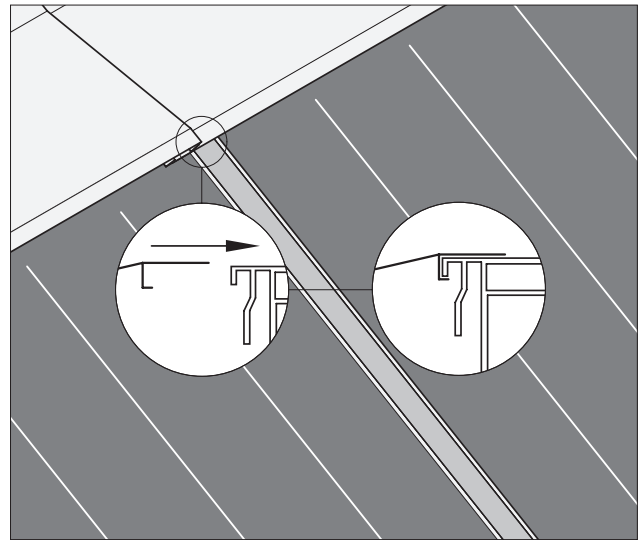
Lay upper flashing sheet in place and push sheet groove over collector lip.
